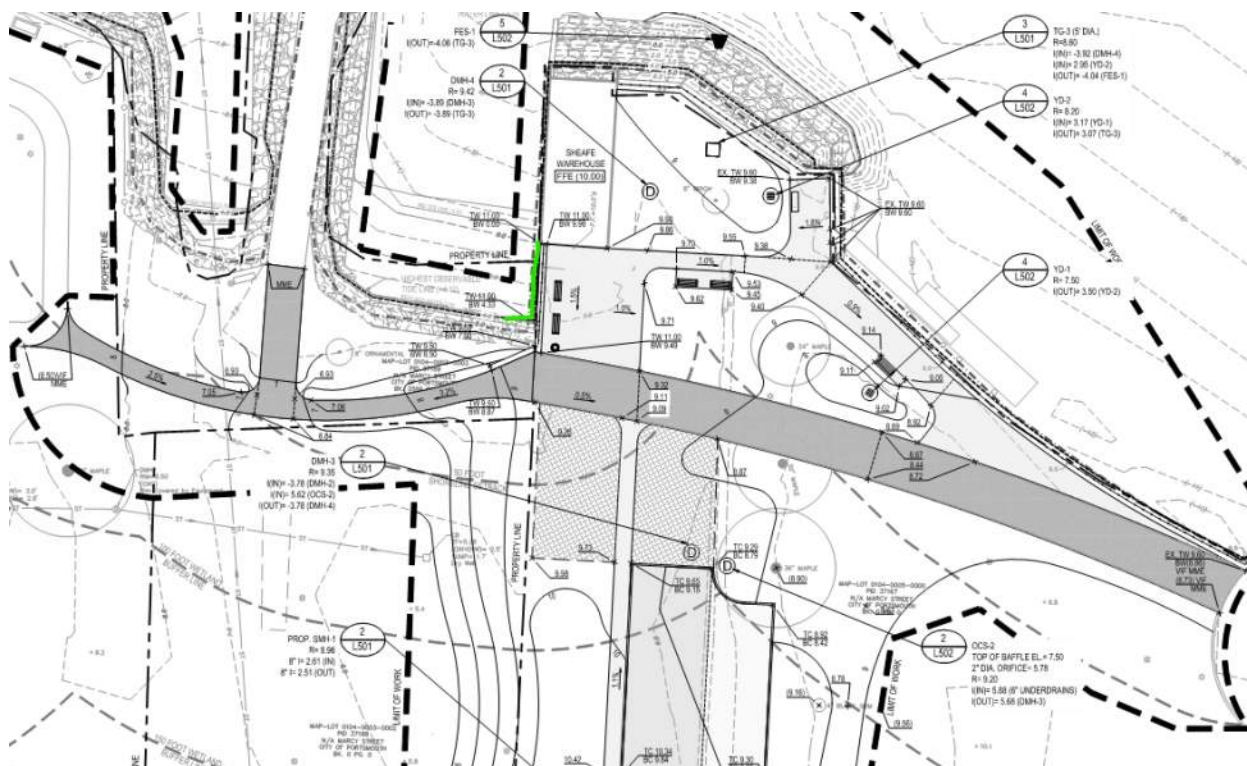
Proposed Vertical Wall Extension From Plan Sheet L140
